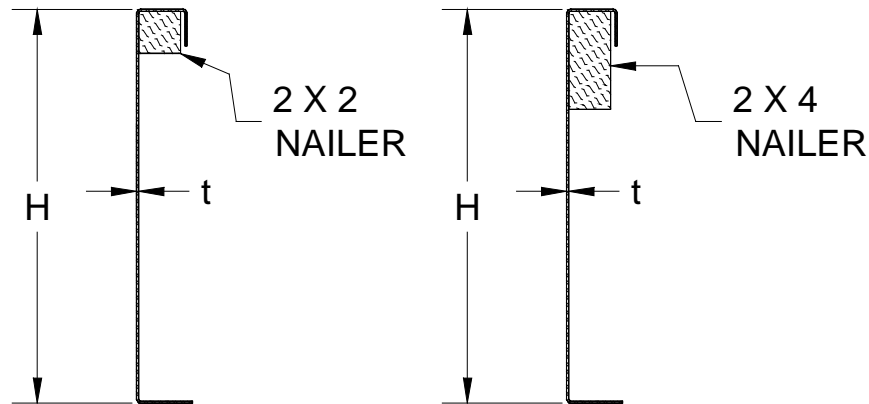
Typical Sheet Metal Curb Sections.
